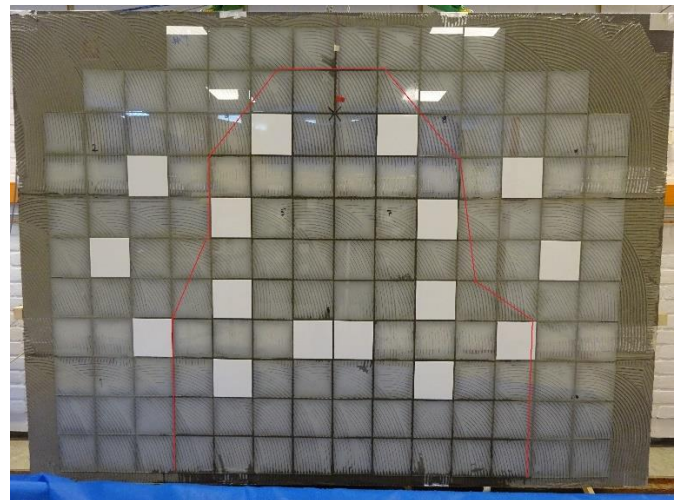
Wall #4 – Outer Moisture Perimeter Created by Saturated Grout
